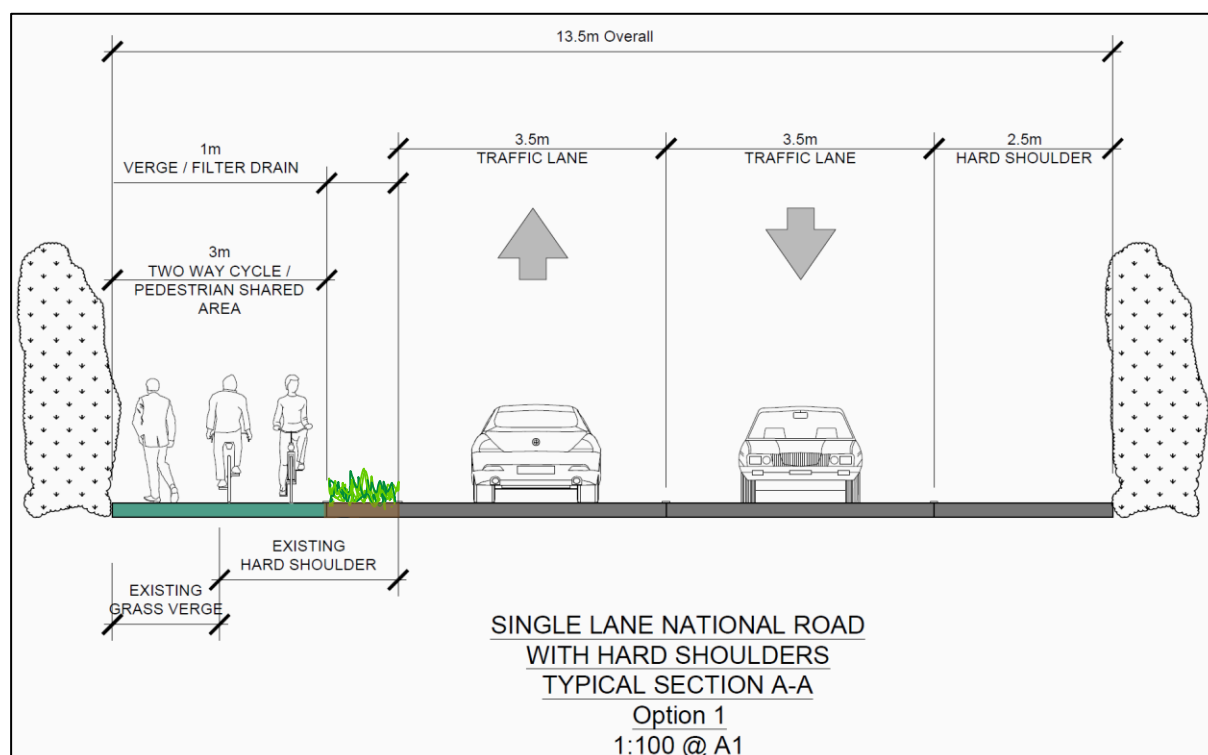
Option 1 for sections with hard shoulders (new grass verge/filter drain separating road from shared facility)
